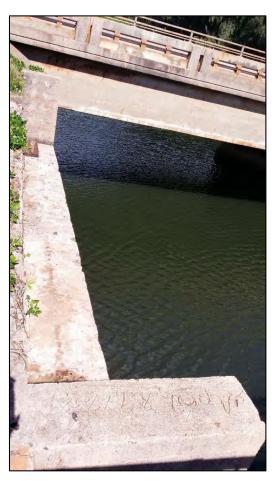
SIHP # -2075 southern bridge abutment, view to west
